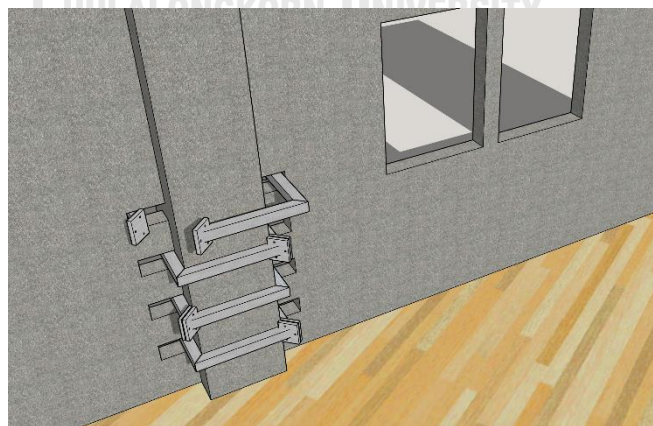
(a) Construction practices directly steel bar of columns to footings or
